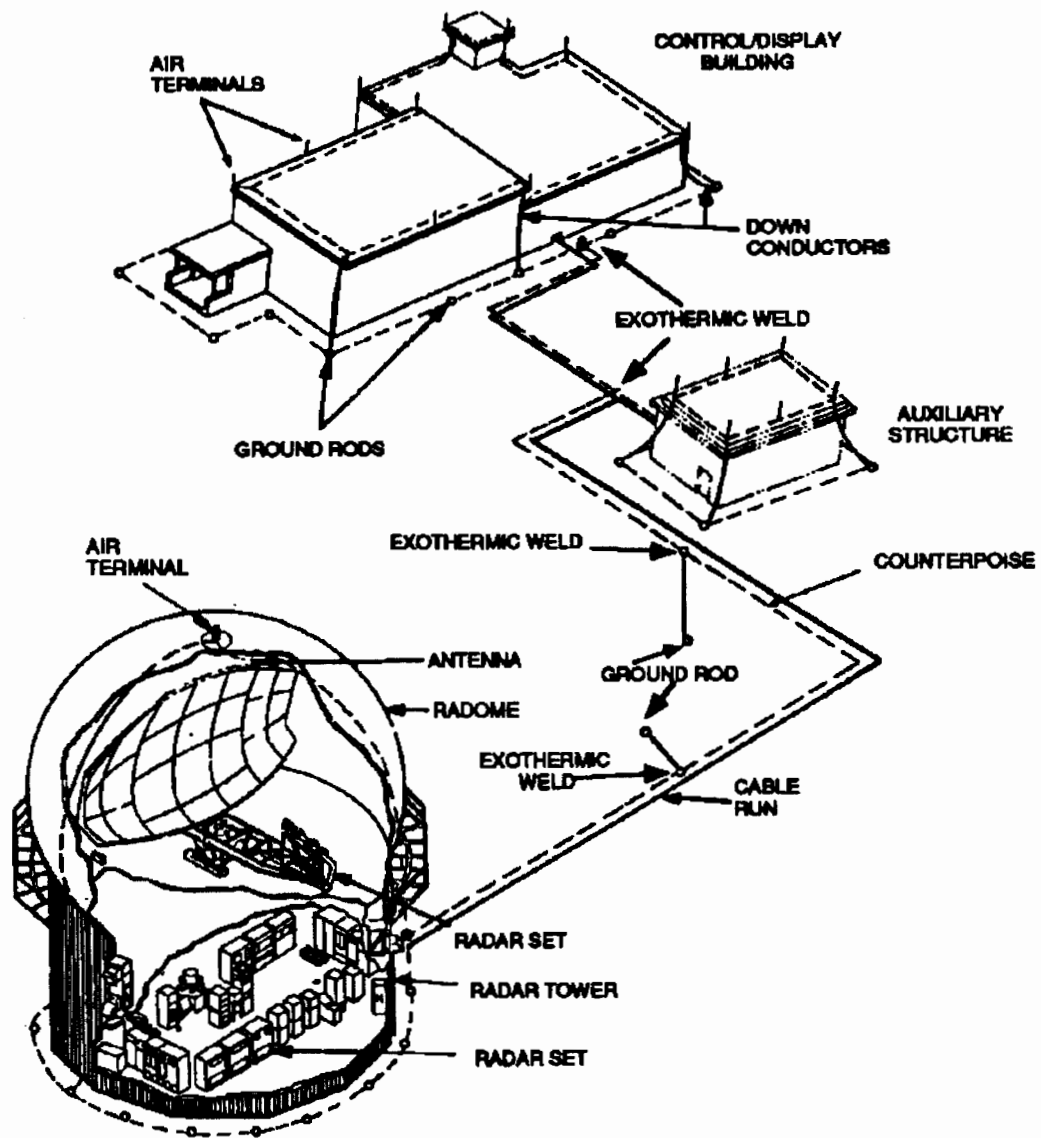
GROUNDING SYSTEM FOR TYPICAL RADAR INSTALLATION
